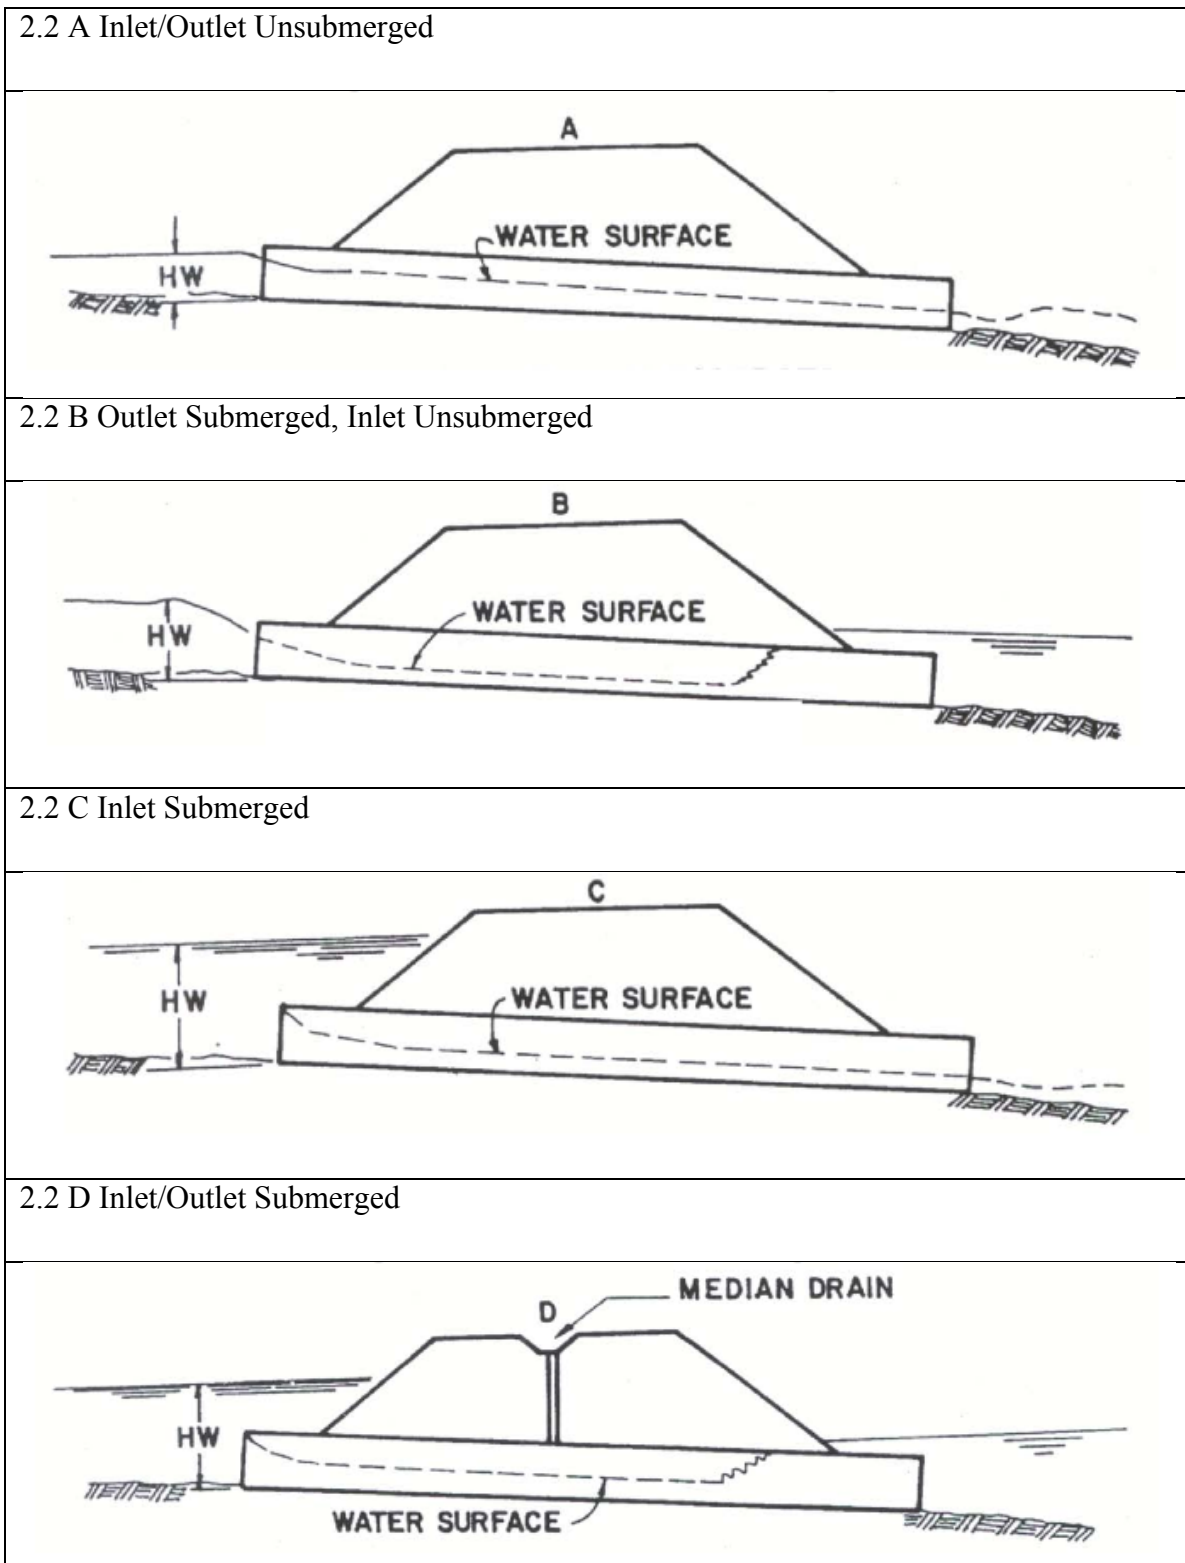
Inlet controlled culverts (FHWA, 1998)
